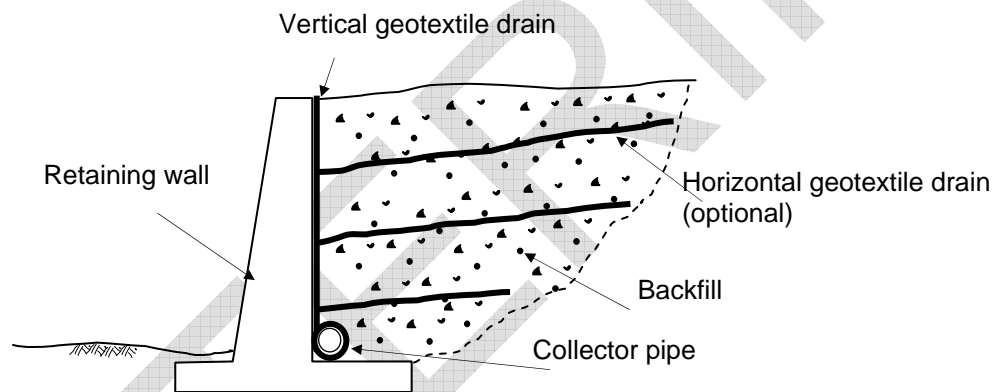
Geotextile (or geofabric) drain behind a retaining wall. A similar arrangement may be used behind bridge abutments.
